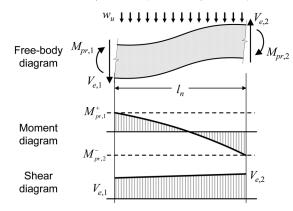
Design shear for conventionally reinforced coupling beam. Reversed loading case also must be considered.
